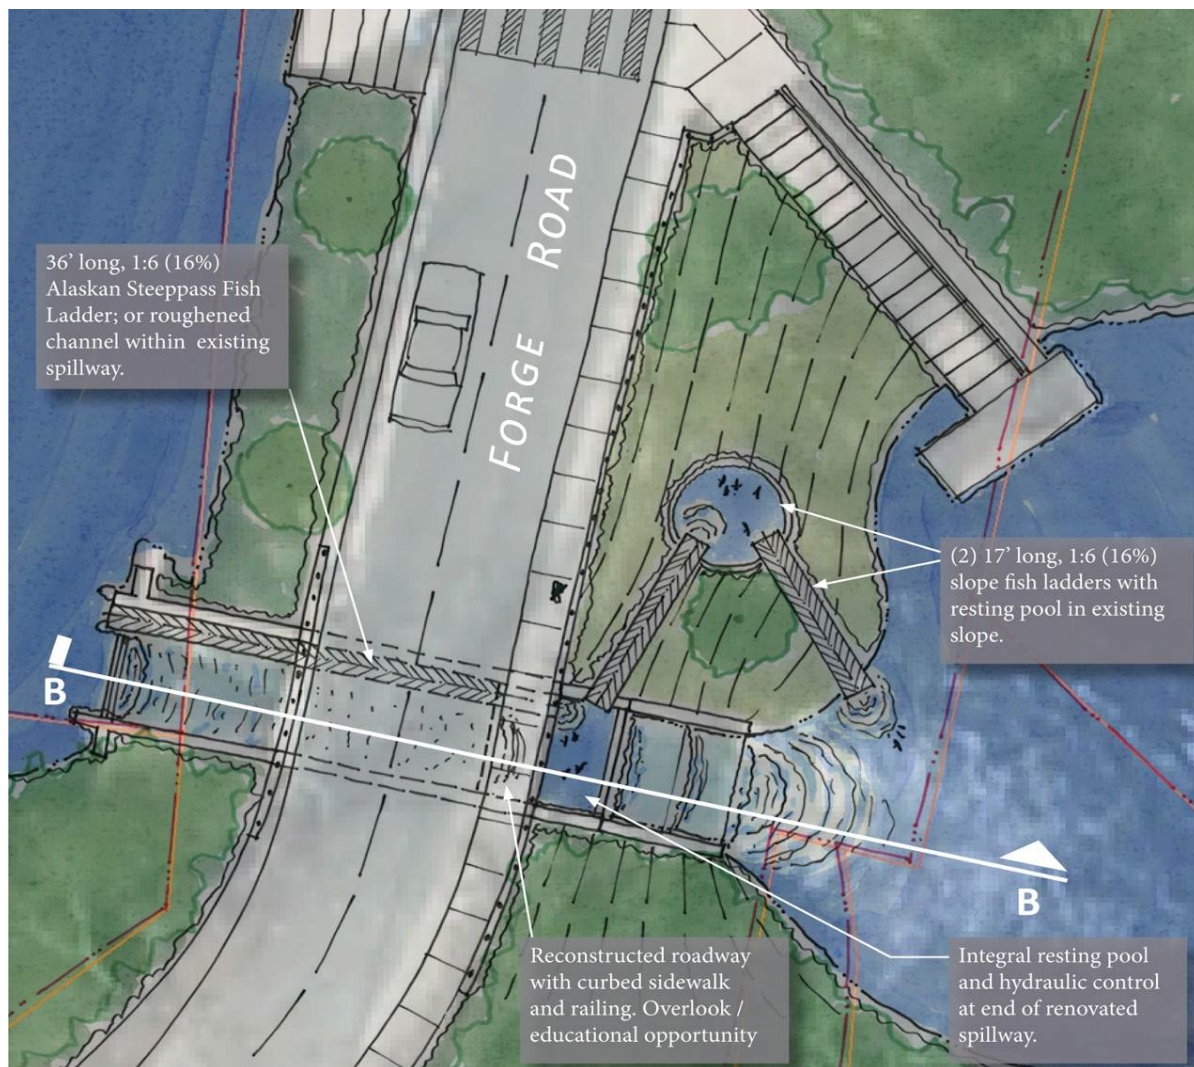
Concept Plan Sketch: Fish Ladder incorporated into Forge Road Dam Spillway structure.
